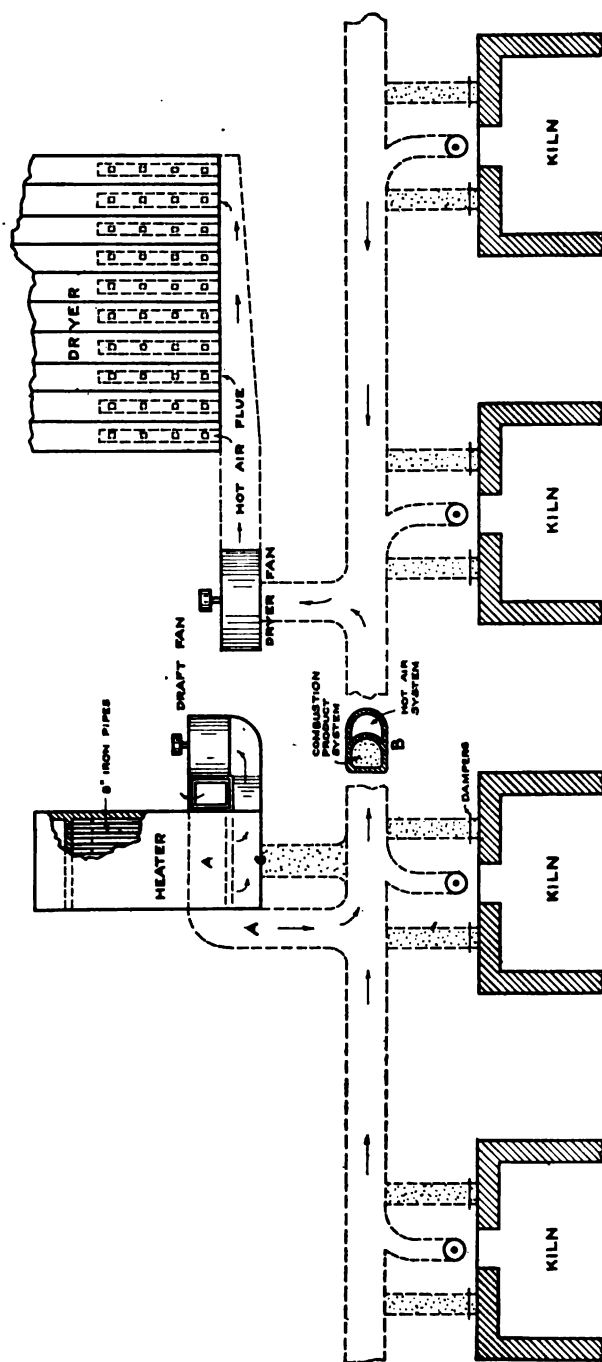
Ground Plan of Groveport System of Heating Air for Drying Purposes.
